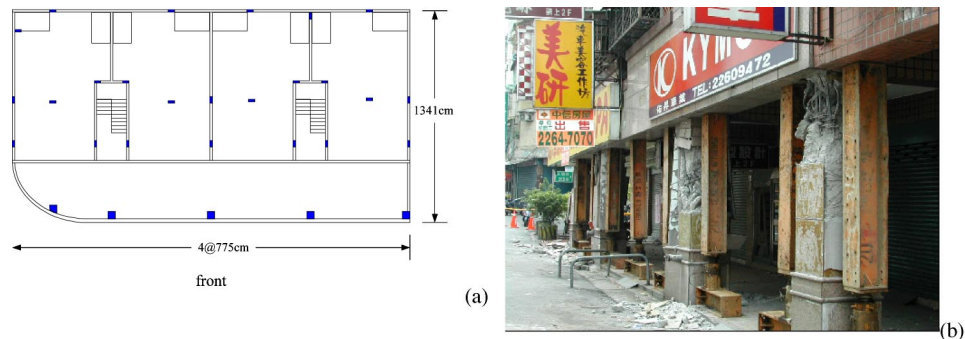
(a) Schematic plan of a 5-story condominium building, and (b) columns along corridor that were seriously damaged and shored with steel columns and jacks.
